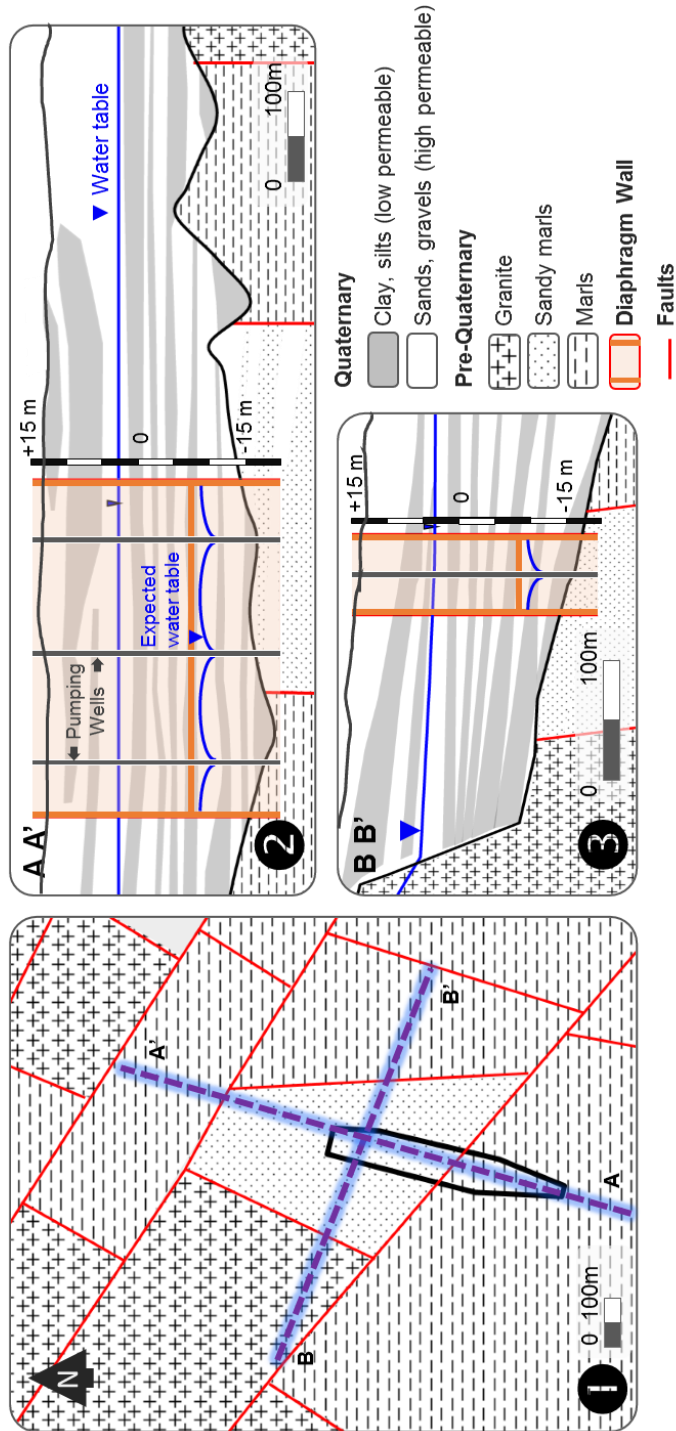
Detailed geological profile of the site. (1) Plan view of the geological basement, (2) Cross section A-B, (3) Cross section C-D. Excavation area, limited by diaphragm walls, is shown in light brown color. Both cross sections show the maximum excavation and the required dewatering system.
